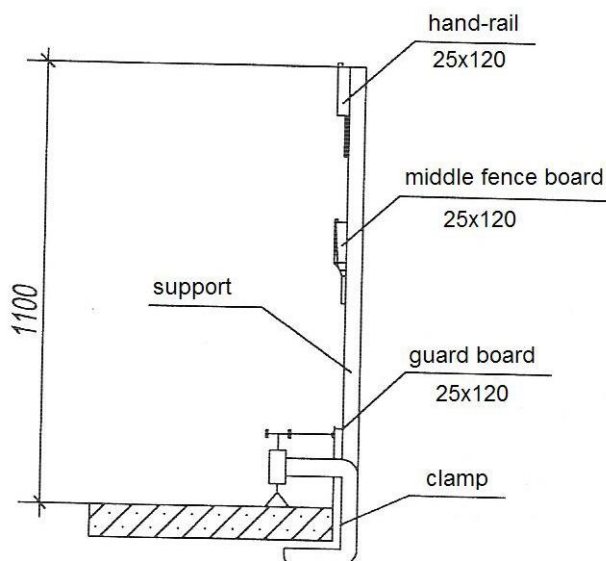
Scheme of ceiling barrier (Telichenko V., Teren'tjev O. & Lapidus A. 2006)
